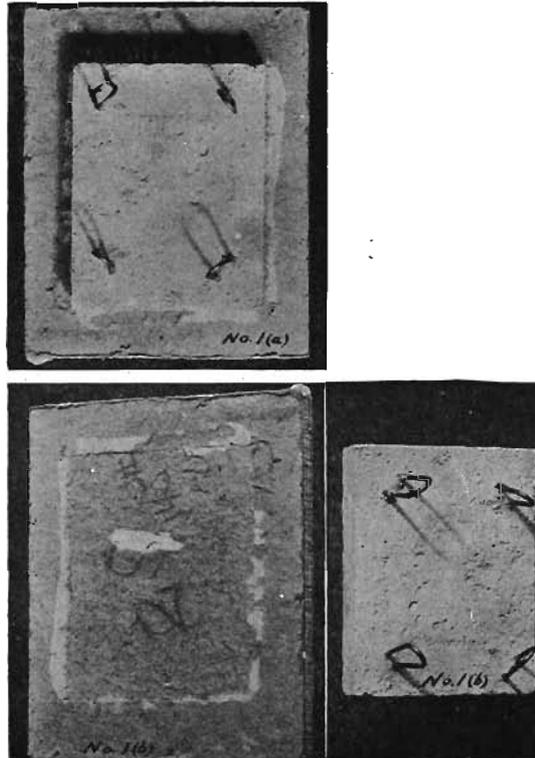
Photograph showing method of preparing specimen of plaster board for the adhesion tests described in the test. No. 1 (a) specimen before weights were attached. No. 1 (b) after bond between plaster and board was broken. Courtesy U. S. Gypsum Co.
